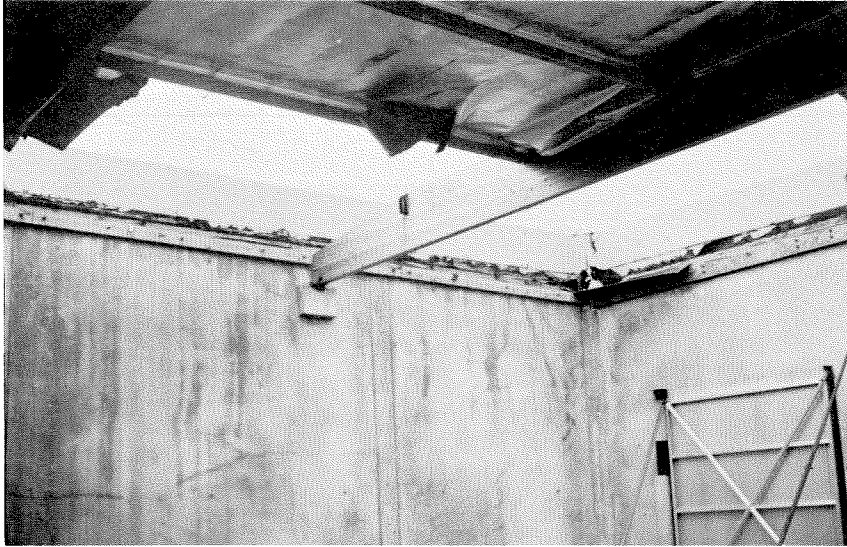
Roof-structure details in the building at 12880 Bradley Ave. The plywood roof cladding is nailed to the timber ledger bolted to tops of the walls.
